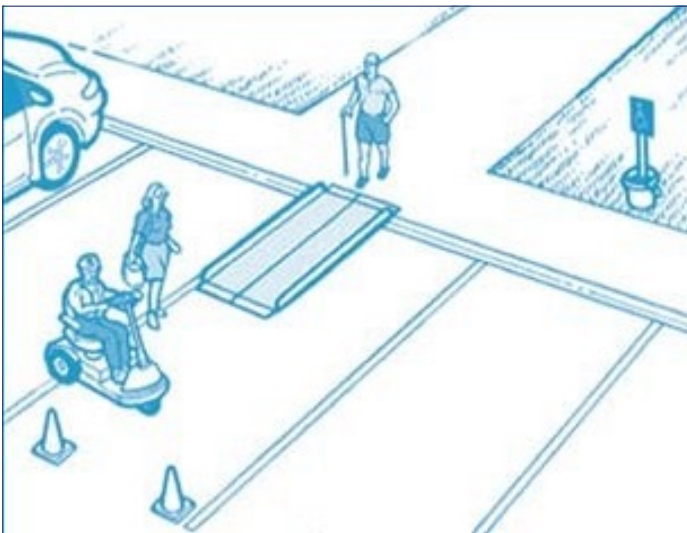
A portable ramp with edge protection is installed over a curb to provide an accessible route.
